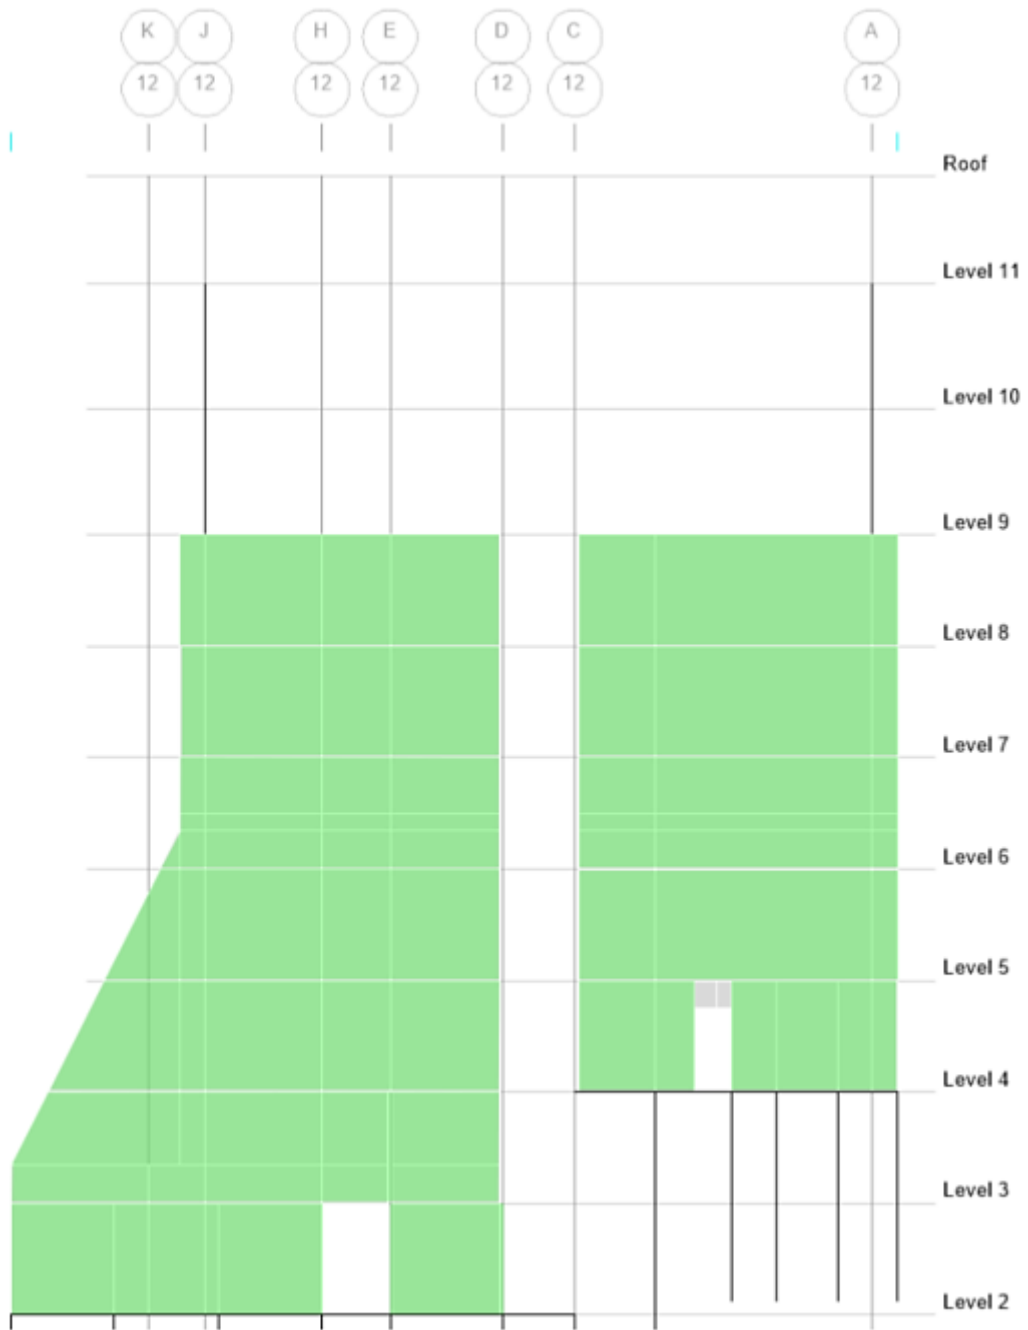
, Gridline 12 Transverse Direction Wall – South Structure
